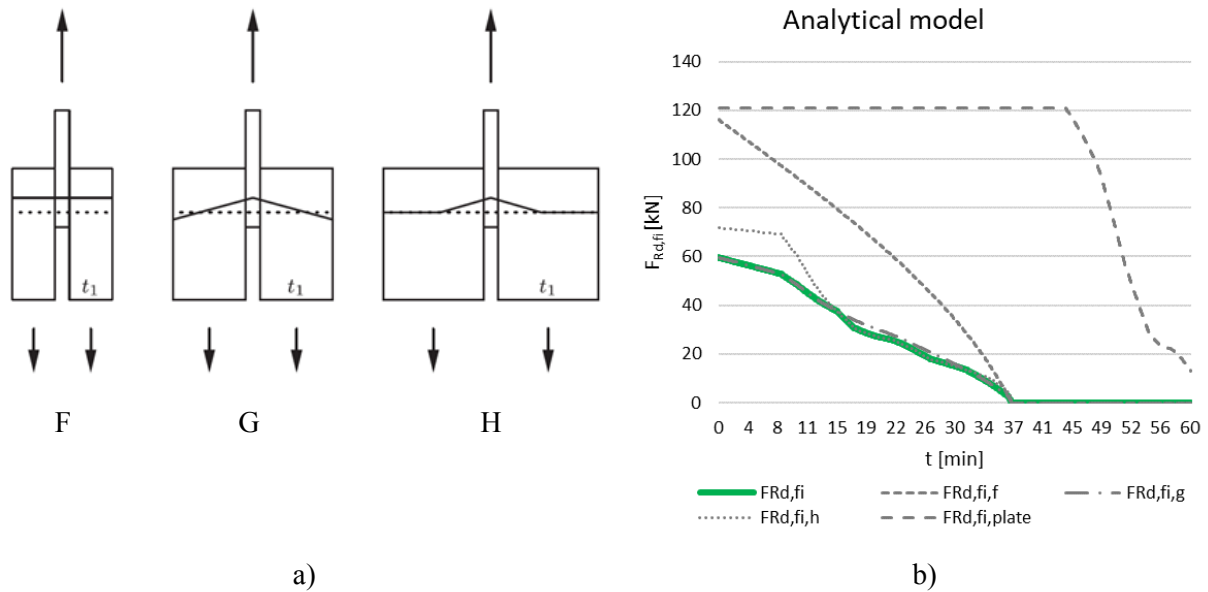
a) Failure modes of steel-to-timber connections; b) Load-bearing capacities for failure modes, the steel plate, and the assembled load-bearing capacity.
